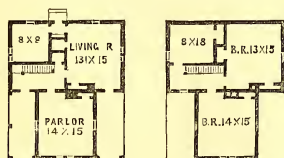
First floor.* FIG. 50—*Second floor.
